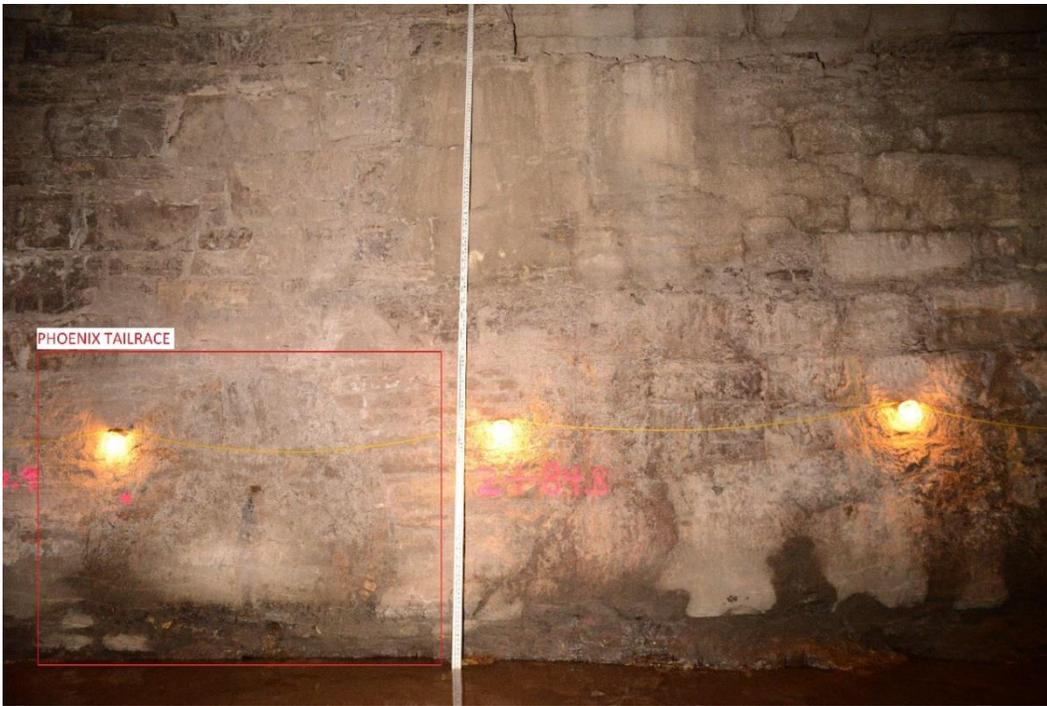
River side wall bulkhead where Phoenix headrace once intersected the tunnel.
